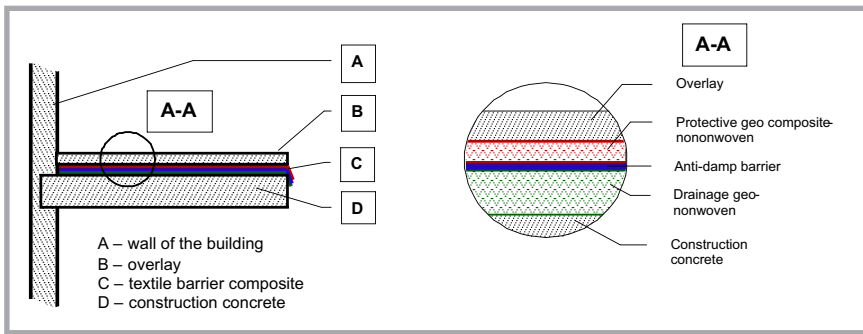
Example of the position of the hydro - insulating composite in a concrete structure.
